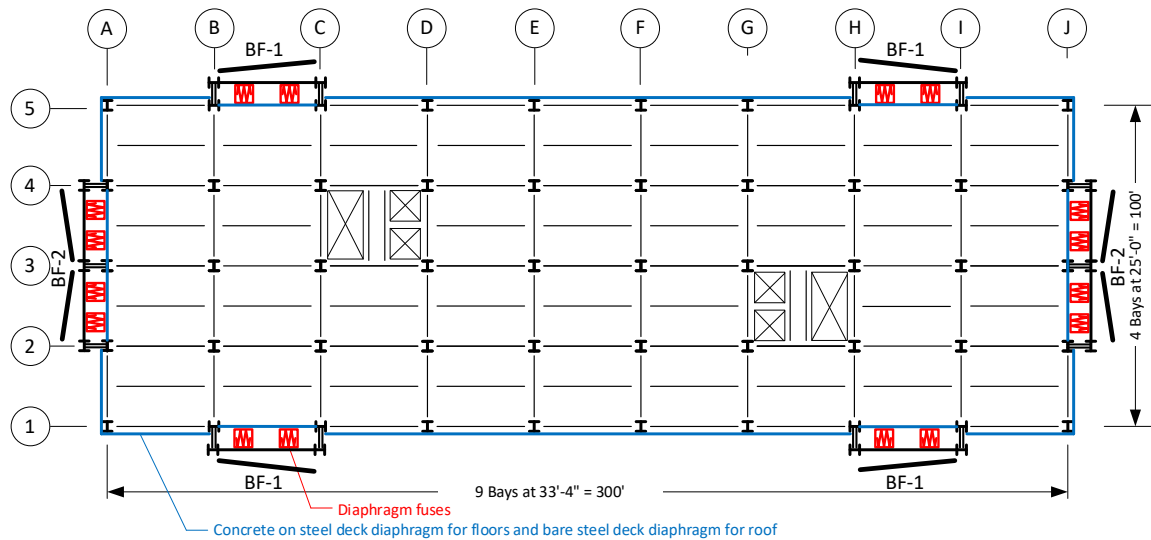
Typical floor framing plan of BRB building archetype and layout of diaphragm fuses
